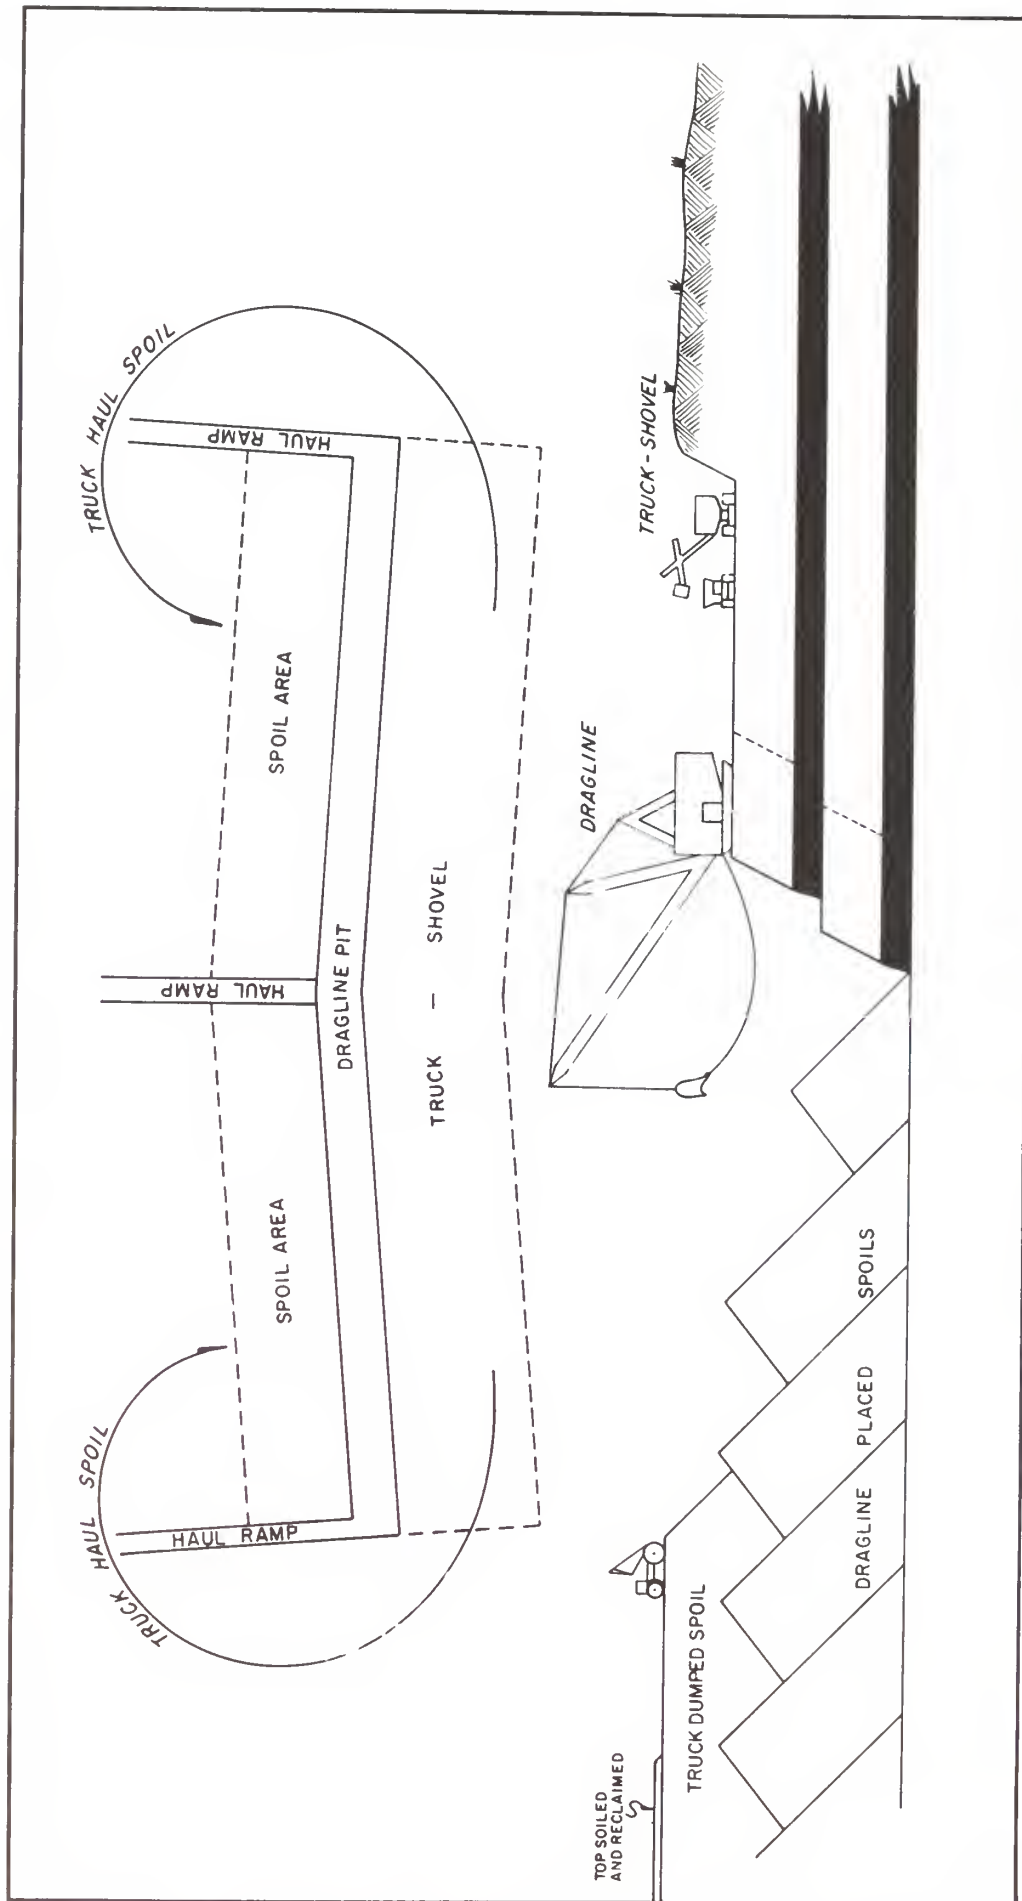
Schematic diagram showing method of overburden removal and placement of spoils under Alternate Mining Plan B-1 in the East Decker area.
